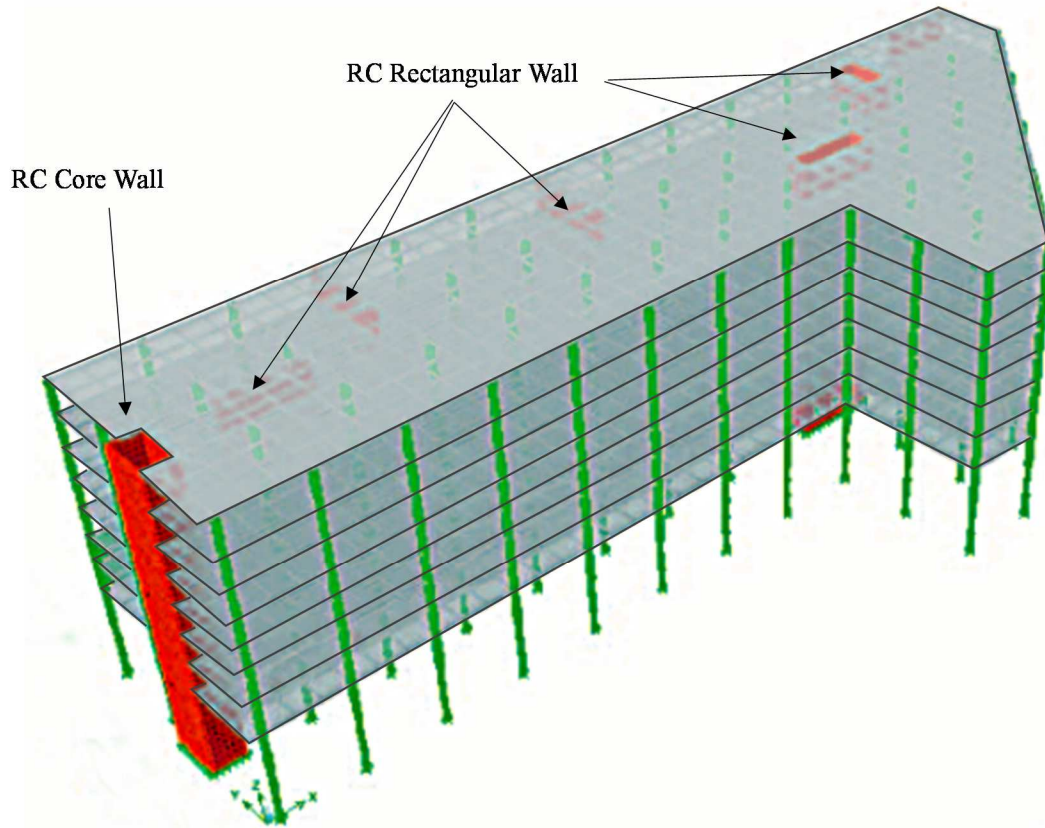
Layout of the numerical model of an eight-story reinforced concrete building with an unsymmetric plan (Penneton et al., 2006)
